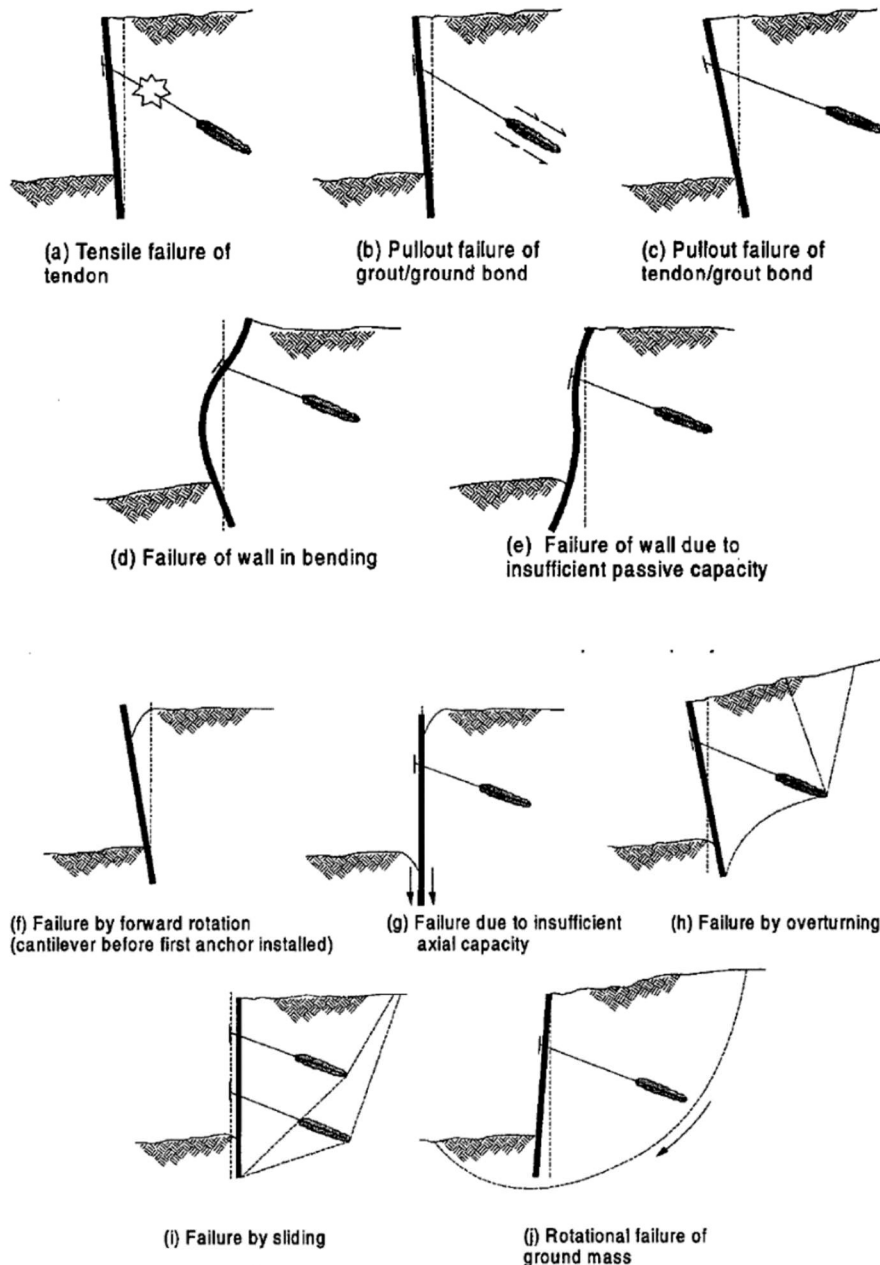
Potential failure conditions to be considered in the design of anchored walls<sup>[5]</sup>
